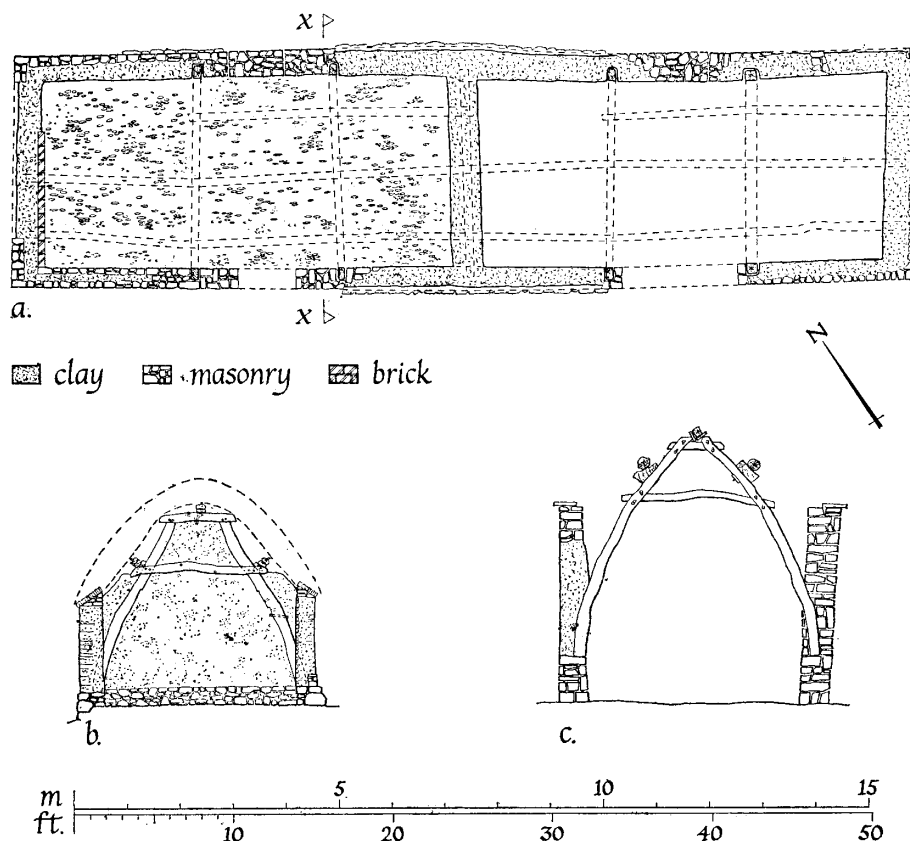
Cruck-Framed Building, Prior Linn, Canonbie.
